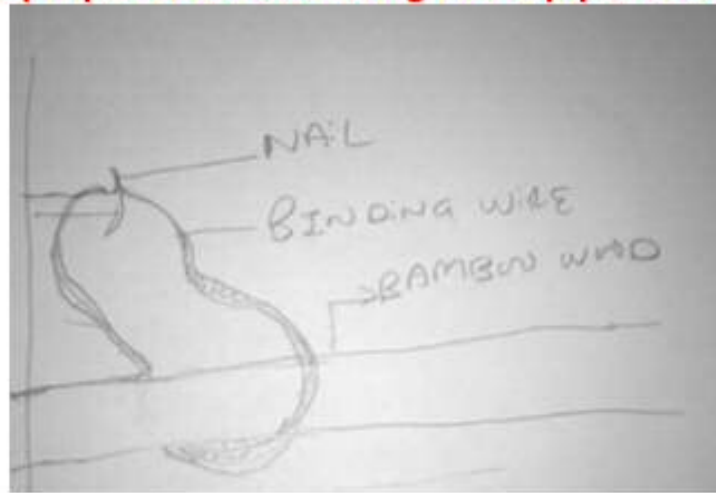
; Anchoring binding wires to hardwood support, source: Author, 2014
